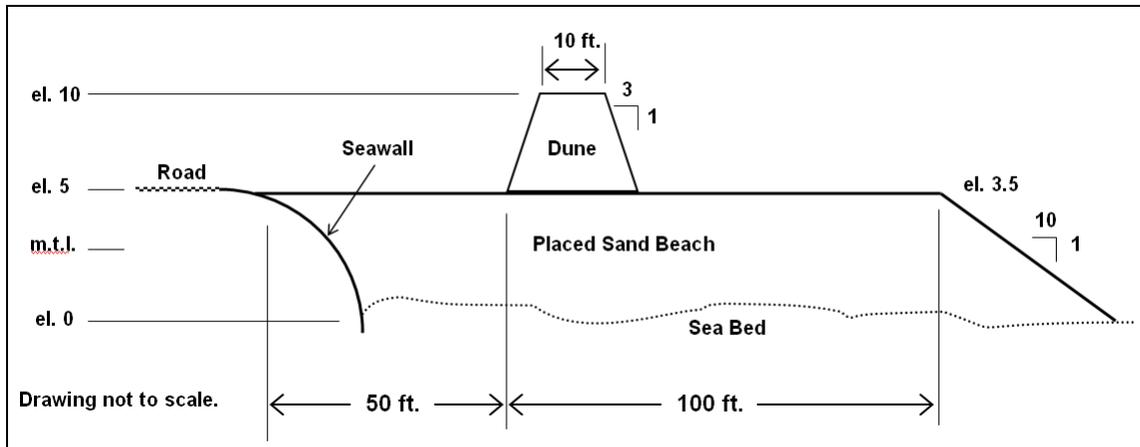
Elevation View, Alternative 2 and Alternative 3 (with Dune) Beach.
